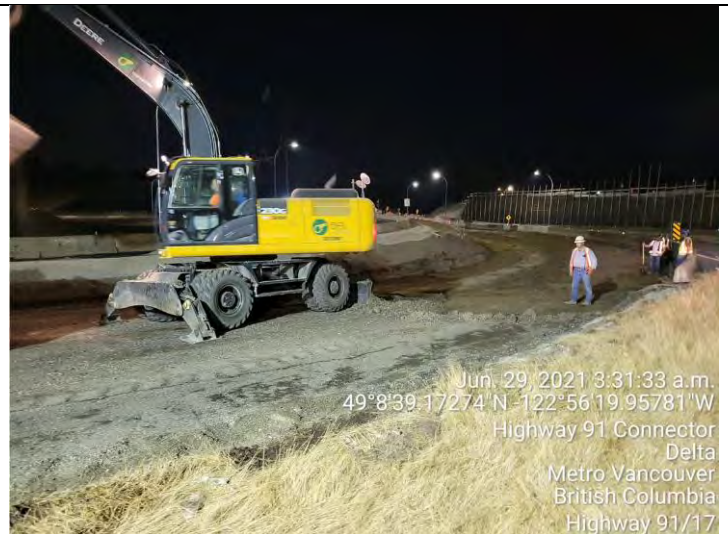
L2200 (G). Excavating milled asphalt and road gravel.
